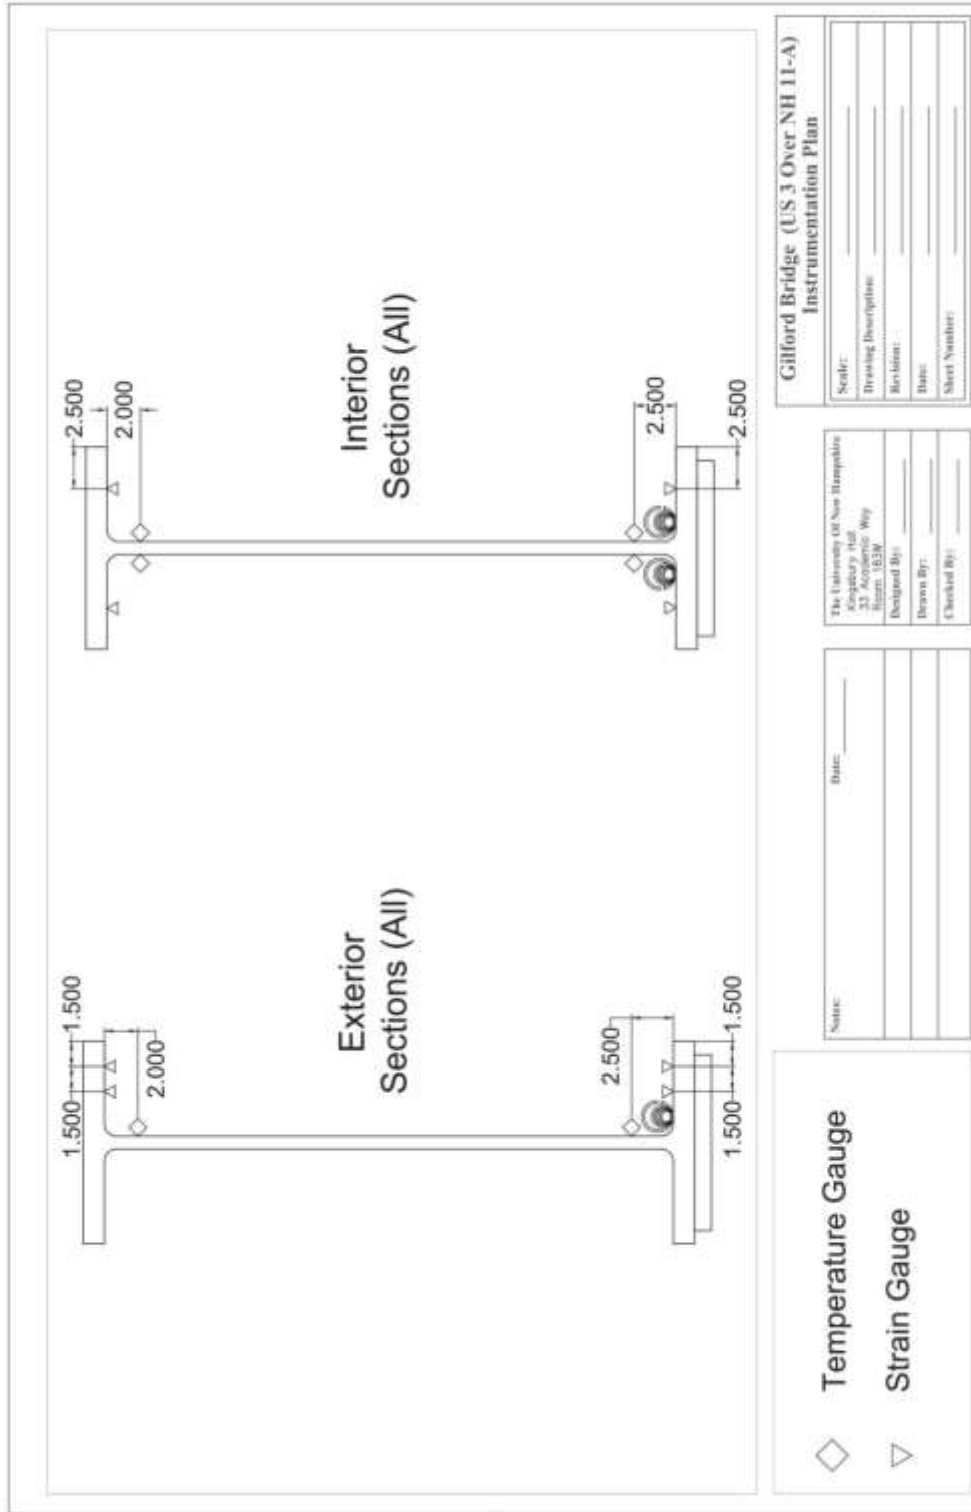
Gilford Bridge – Proposed Cross Sections of Stations on Interior and Exterior Beams
